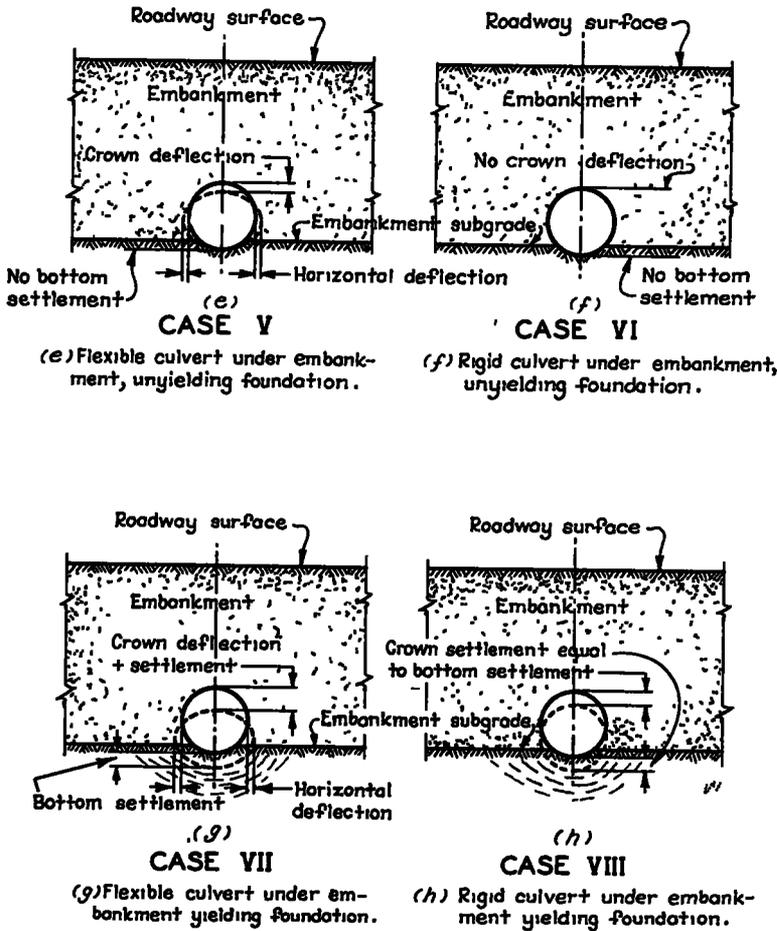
Four Cases of Culverts Installed on Original Embankment Subgrade
